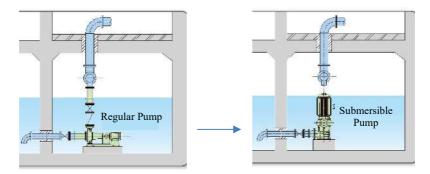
Image of the Floodwater Level, Concrete Structures, and Equipment
